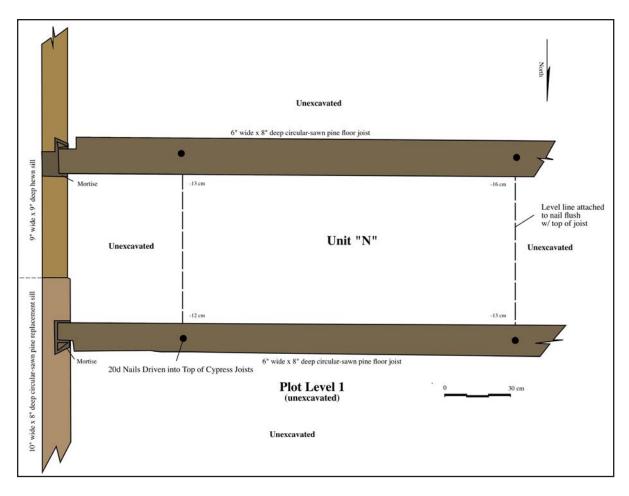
A drawing of Unit N, Plot Level 1, excavated in the northwestern *cabinet* of Yucca House at Melrose Plantation.
